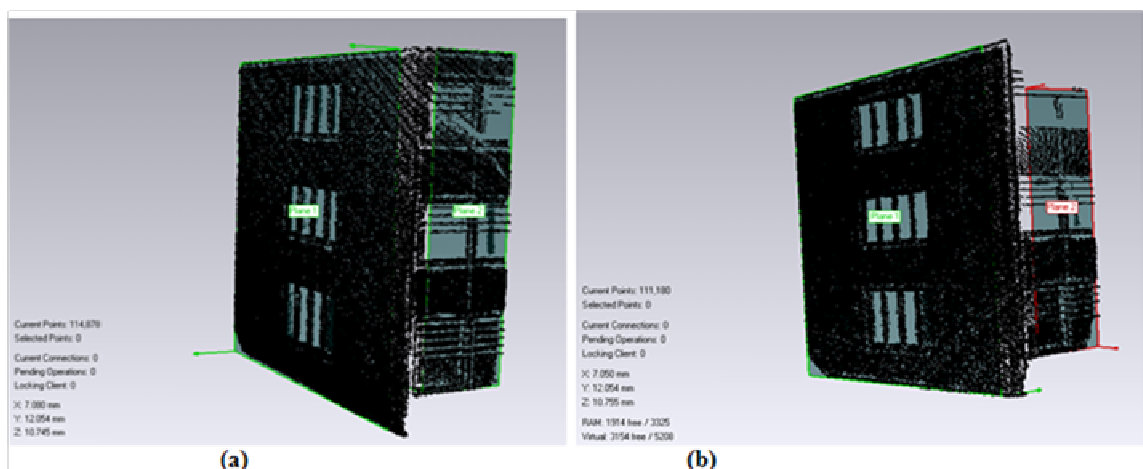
(a) show the creation of planes from the point cloud 1 (front and side) of building façade; (b) shows the same planes on the point cloud 2- Block no. 46
